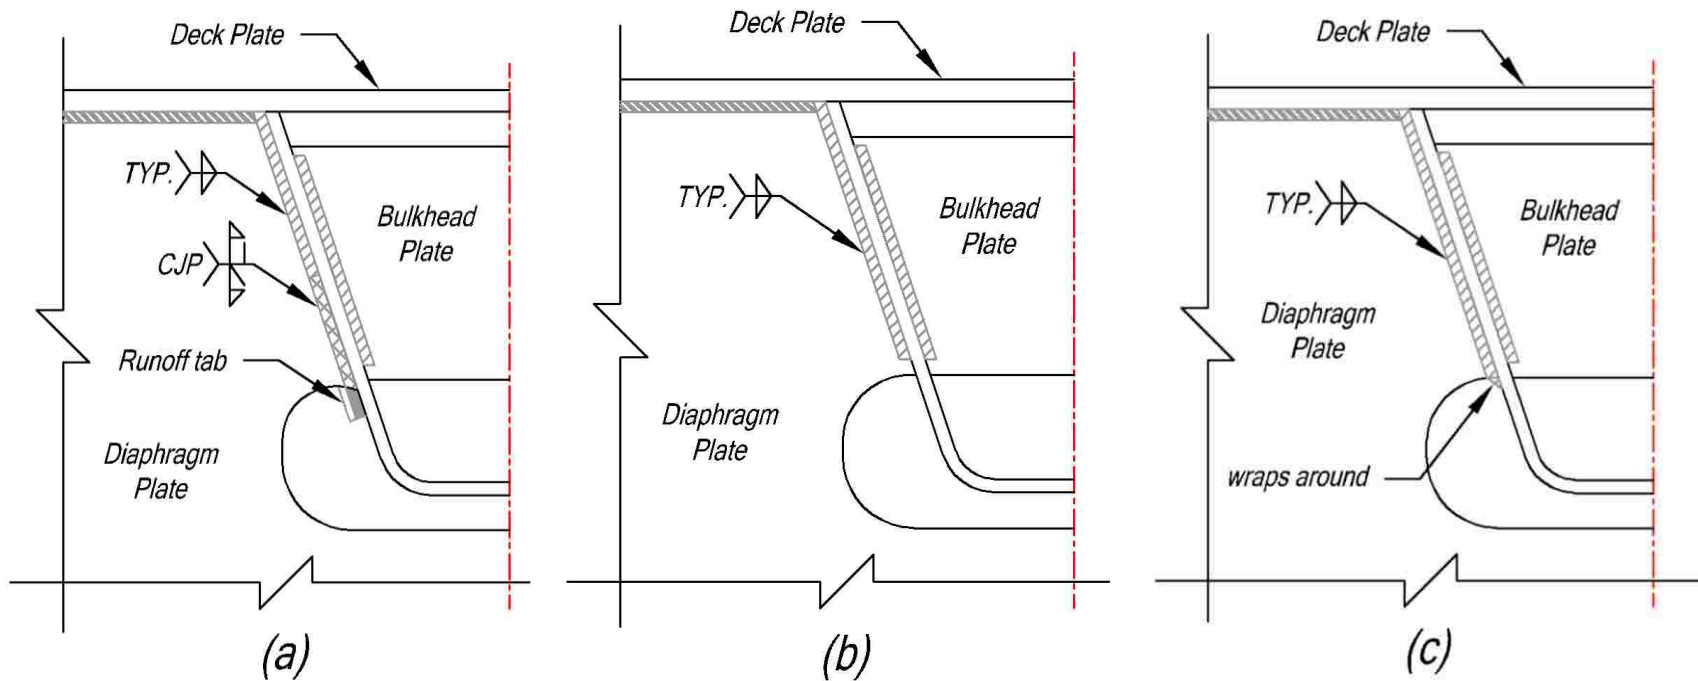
Weld options for the rib-to-floor beam connection in the Williamsburg Bridge fatigue testing: (a) Weld Option A; (b) Weld Option B; (c) Weld Option C (reproduced from Tsakopoulos and Fisher 2003)
